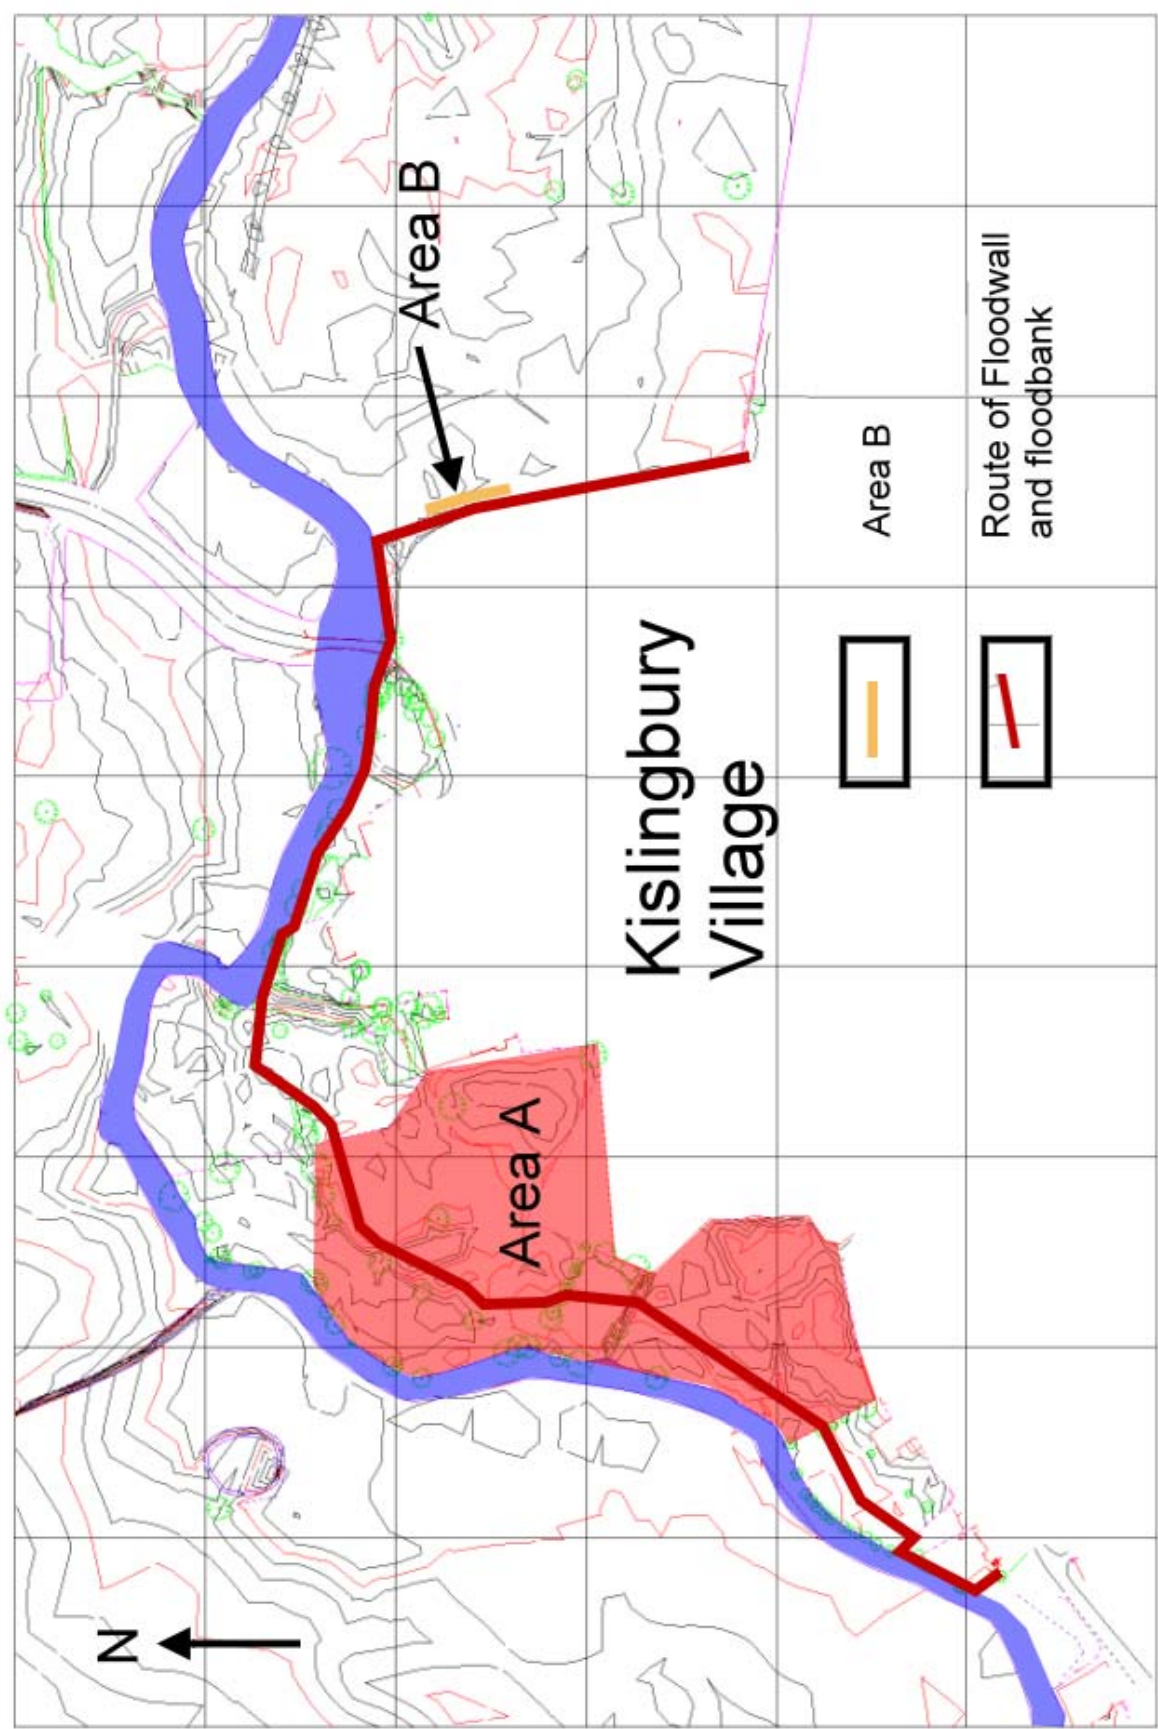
Route of floodwall and floodbank to the west, north and east of Kislingbury (scale 1:4000)
